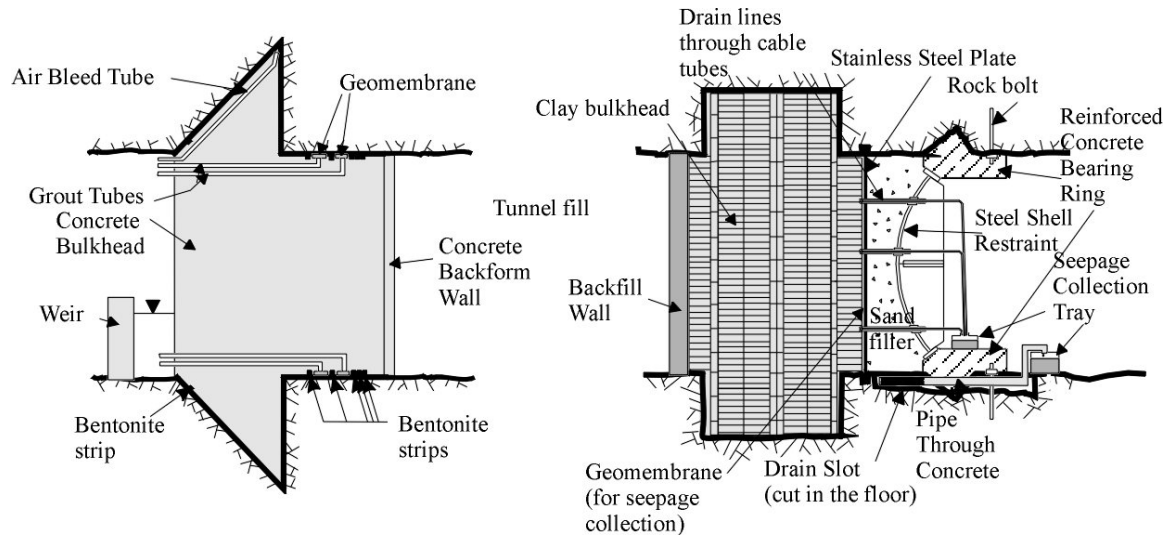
Clay Bulkhead and Restraint and Concrete Bulkhead.
